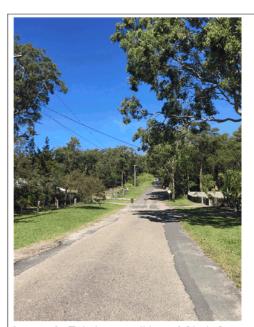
Existing condition of Clark Street looking towards Gan Gan Road.
